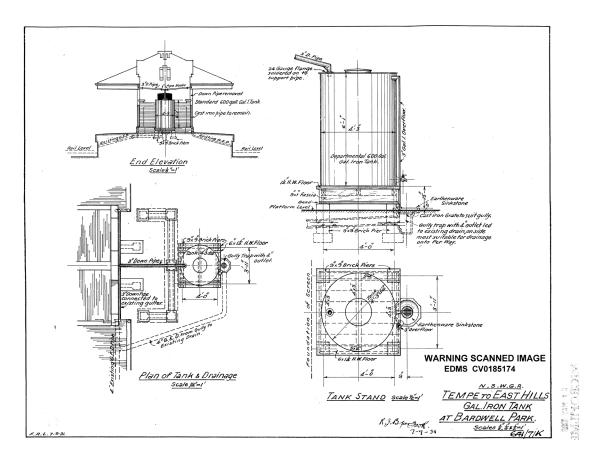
NSWGR Tempe to East Hills – iron tank at Bardwell Park Railway Station, c. 1931 (Virtual Plan Room)
